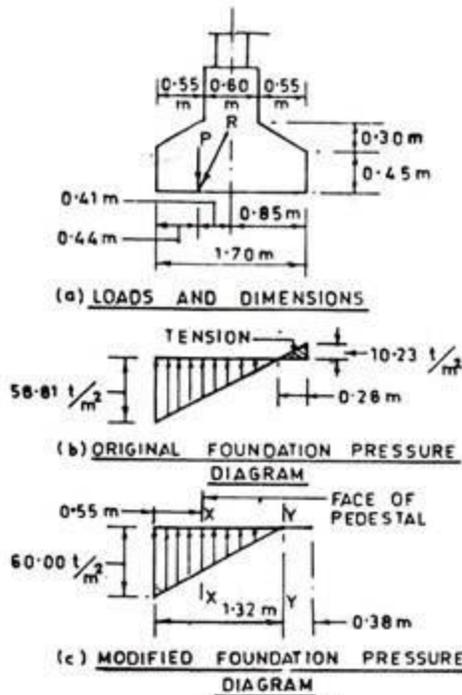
FOUNDATION PRESSURE UNDER RAFT Example 1
